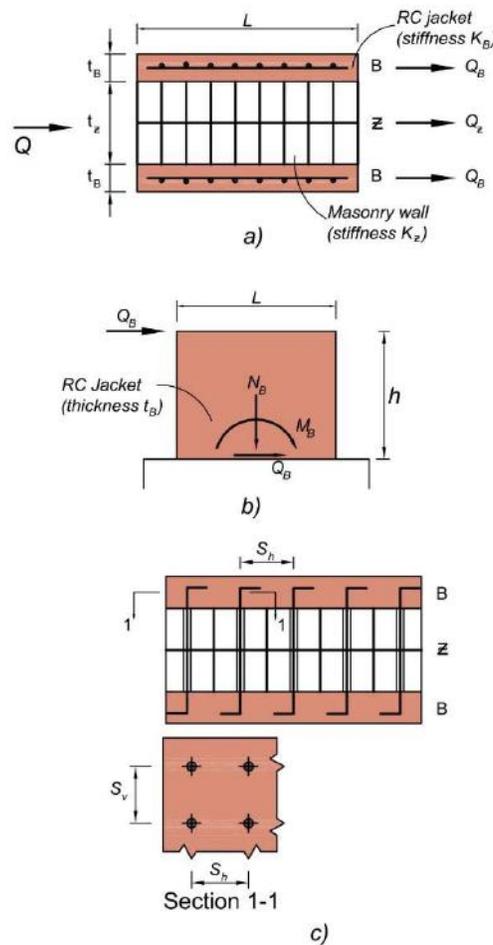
Design approach for RC jacketing of masonry walls: a) horizontal cross-section showing seismic force distribution in a masonry wall with RC jacket; b) vertical elevation showing design forces in a RC jacket, and c) horizontal cross-section showing wall anchors.
